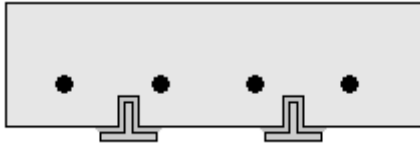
T-shaped NSM FRP bars used for strengthening a reinforced concrete slab, after Blaschko and Zilch (1999).
